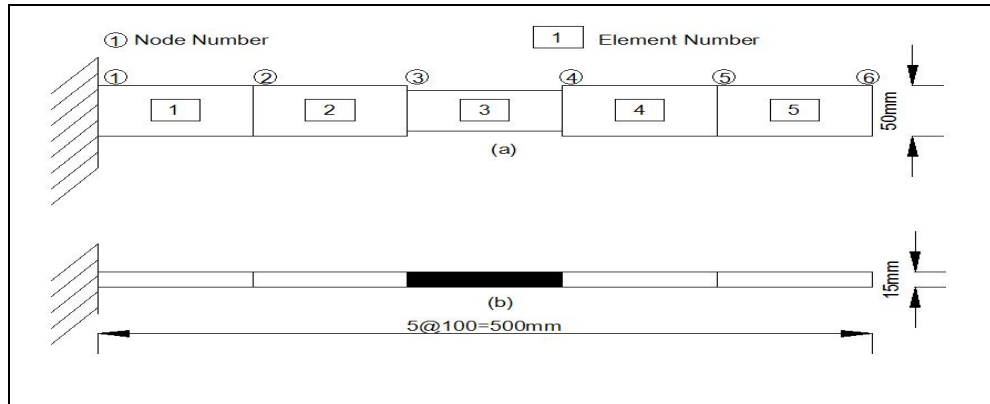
(a) Plan; and (b) Elevation of damaged (Single element) steel cantilever beam.
